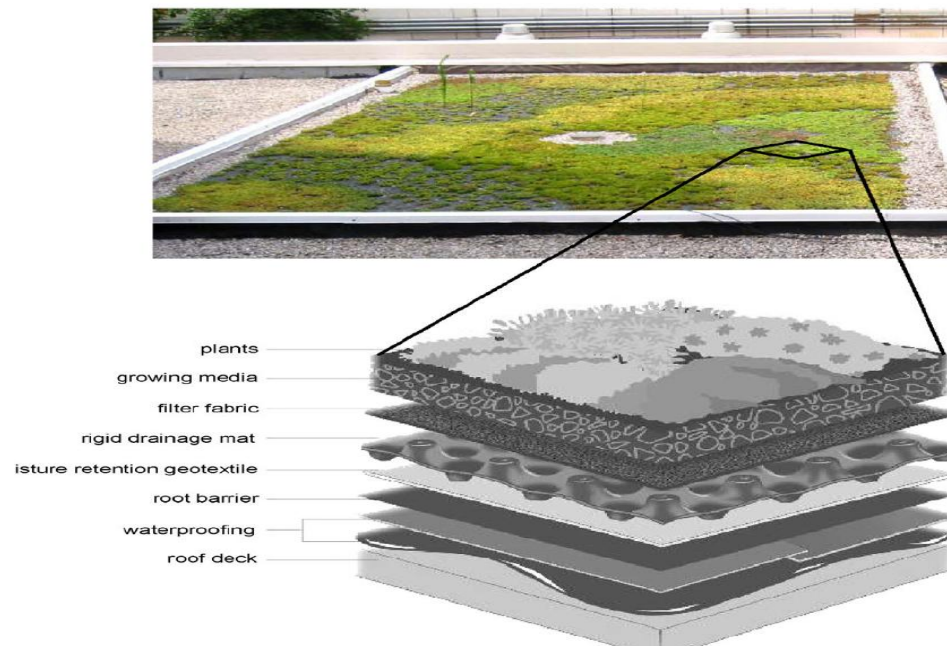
Green roof test plot and layer cross-section (Carter 2006)
